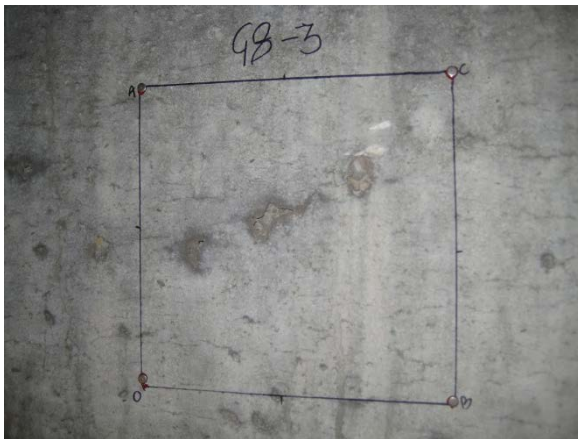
Surface defects on cracked girder at Dallas site (1)
